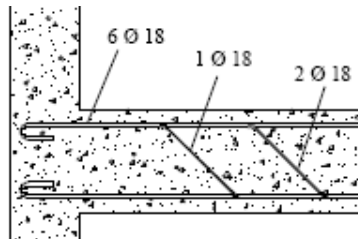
Steel-Retro Benchmark building – Anchorage of the reinforcing bars in the exterior joint
